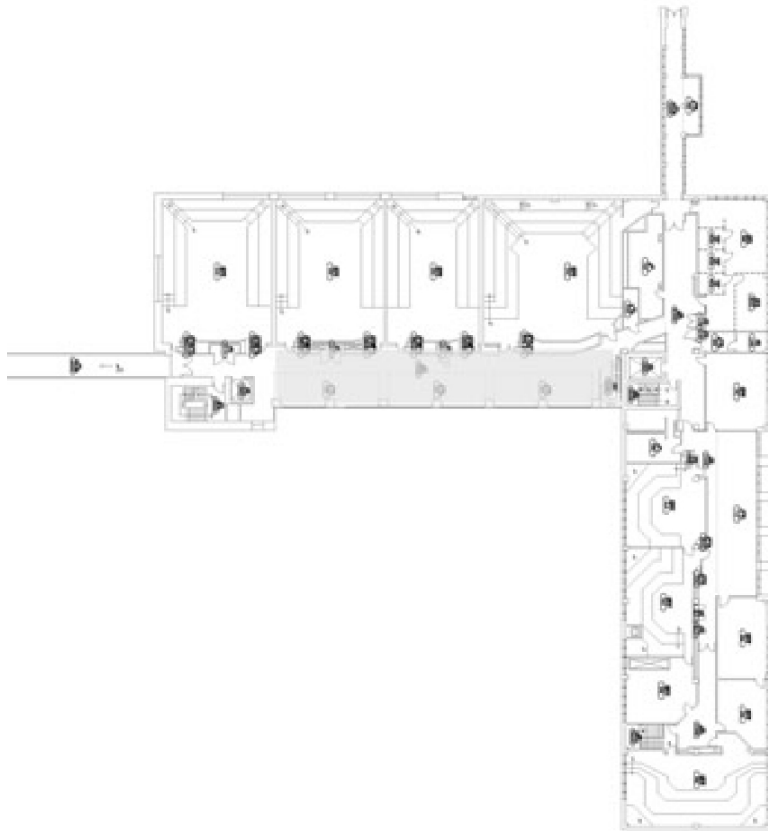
E51 Groundfloor Floorplan- Area of Study Shaded at Lower Right
